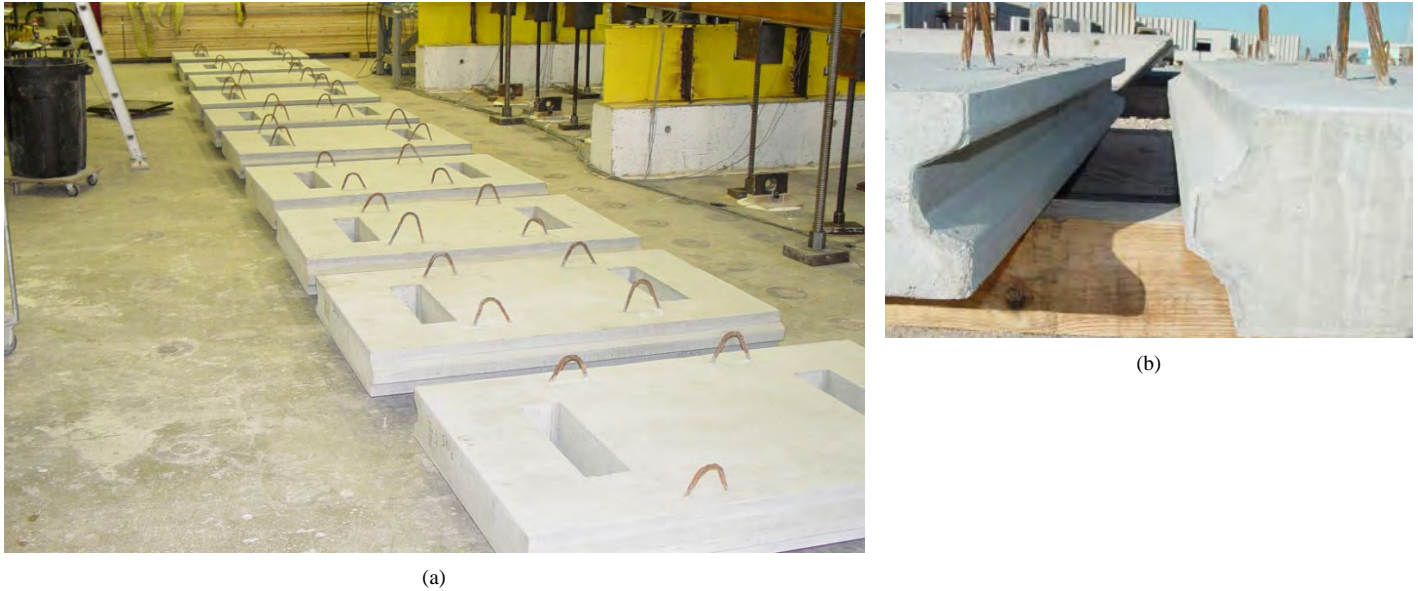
(a) Precast concrete deck panels organized in sequence and (b) match-cast detail.
